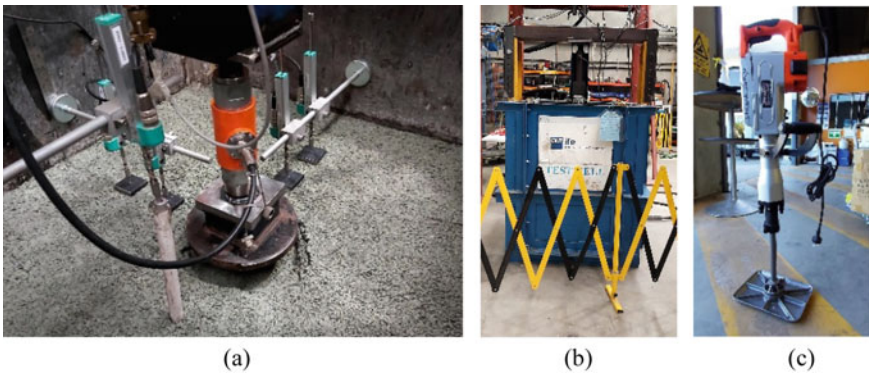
a Loading with 200 mm plate; b model test box; c mechanical compactor
